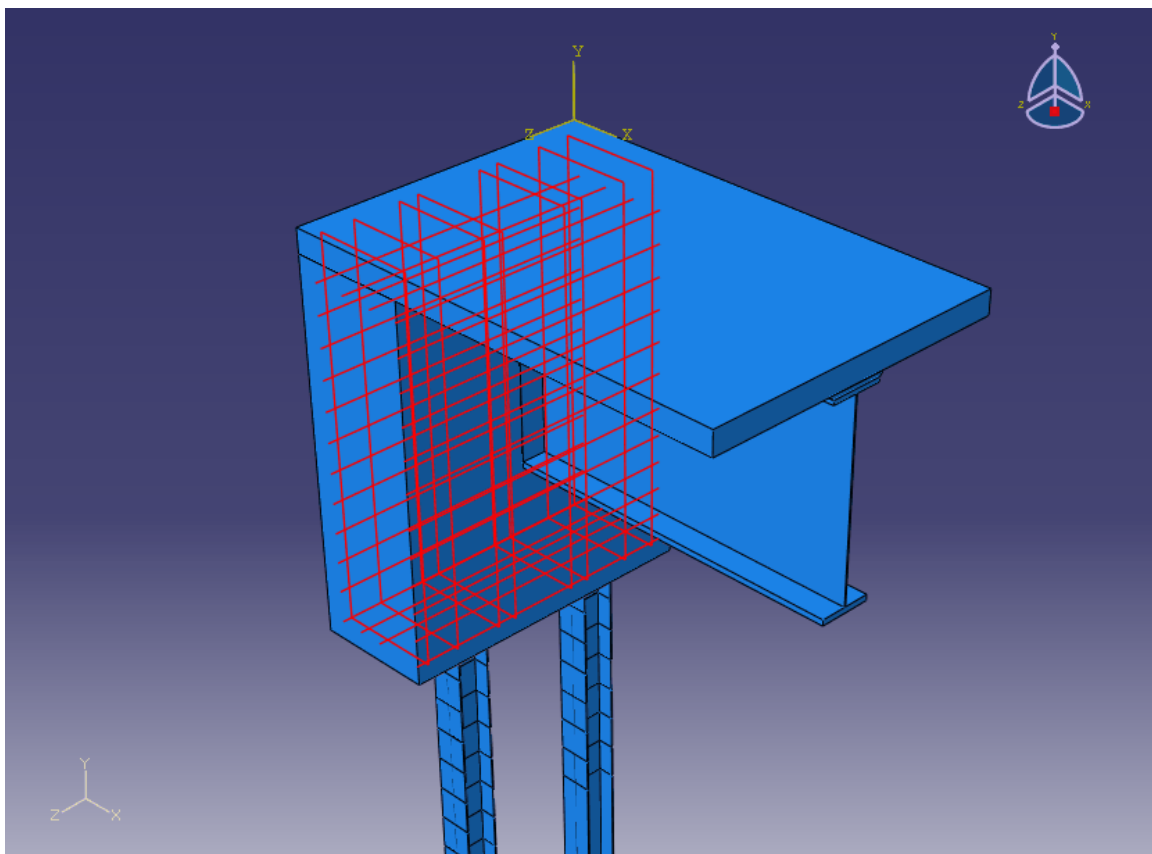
Highlighted Rebars of the Abutment Wall
